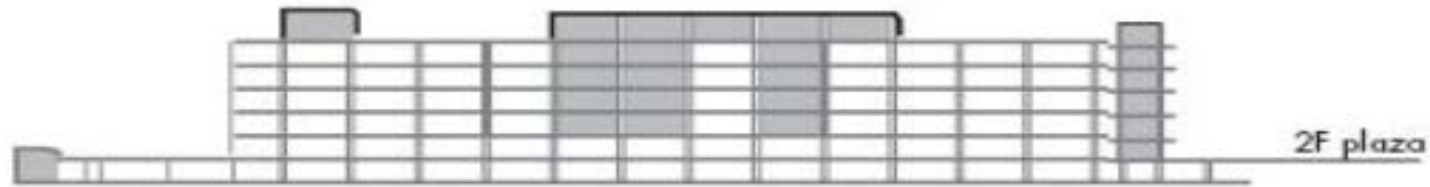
Long section, Olive View Hospital. Note that the shear walls stop at the third floor.
